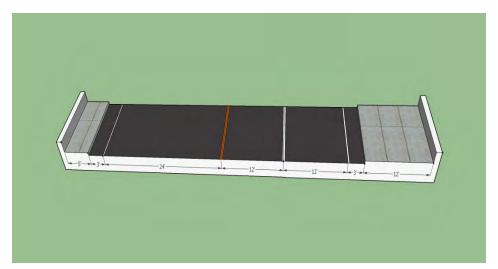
Current design of Cherokee Avenue bridge over I-20 in Grant Park, looking north
